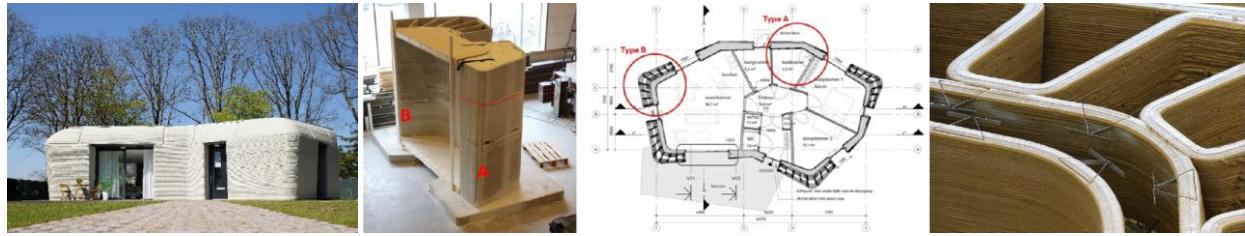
From left to right, Project Milestone (photograph by Bart van Overbeeke), two printed wall types; a plan view showing the wall types; and embedded steel connectors (reproduced from Wolfs et al., 2023).
